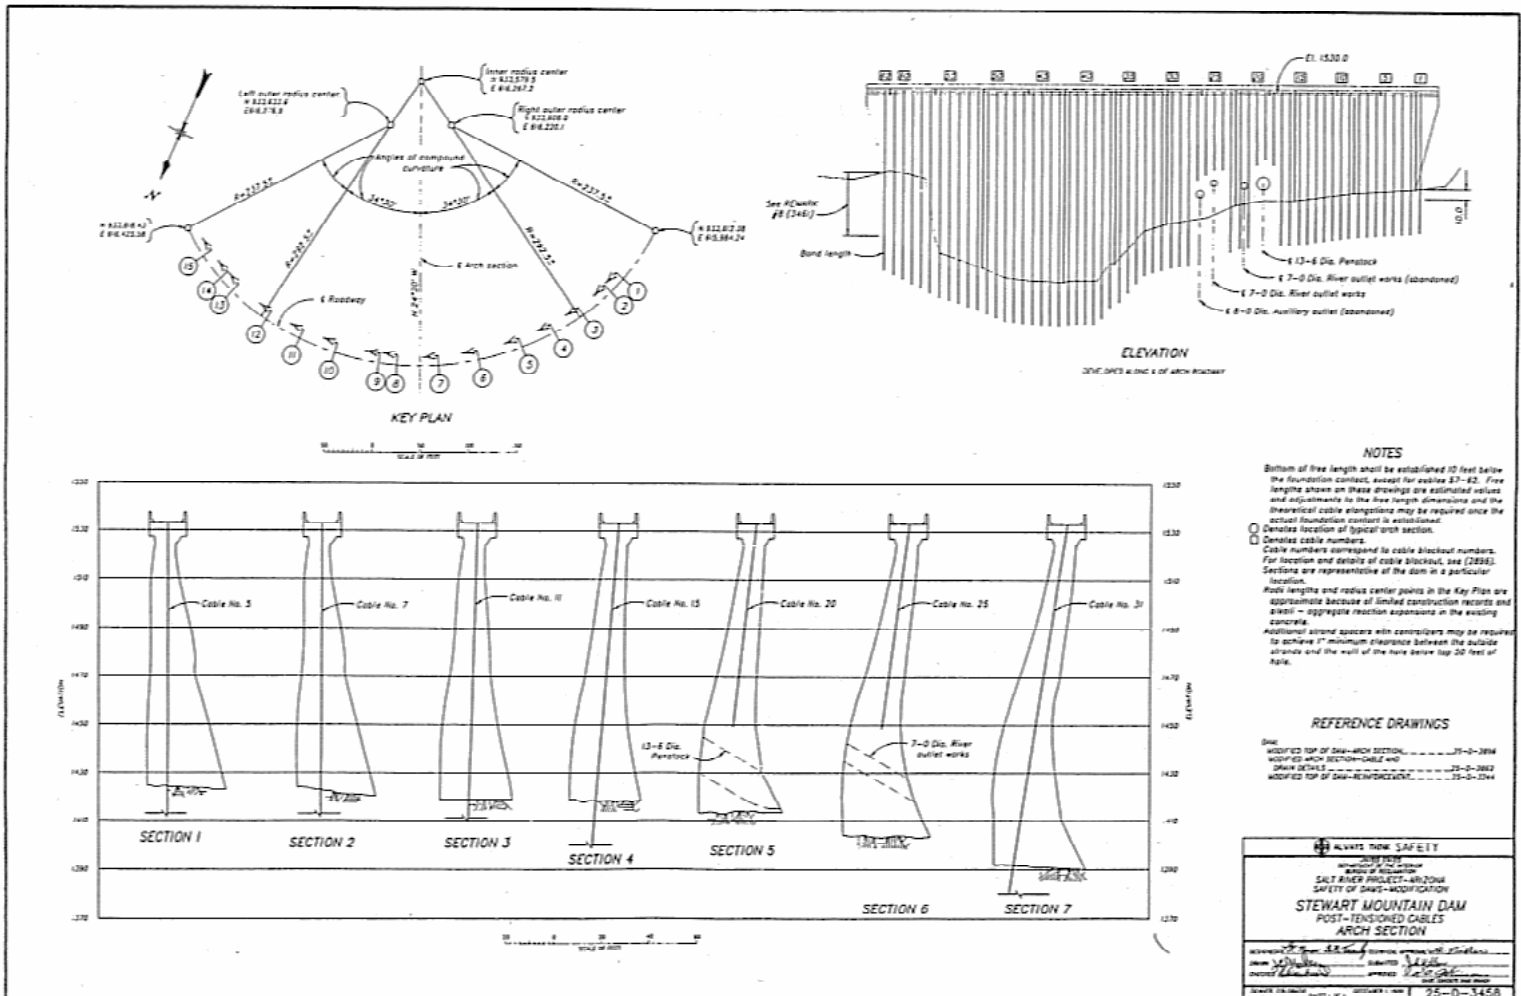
Stewart Mountain Dam — Post-tensioned cables, arch section.
